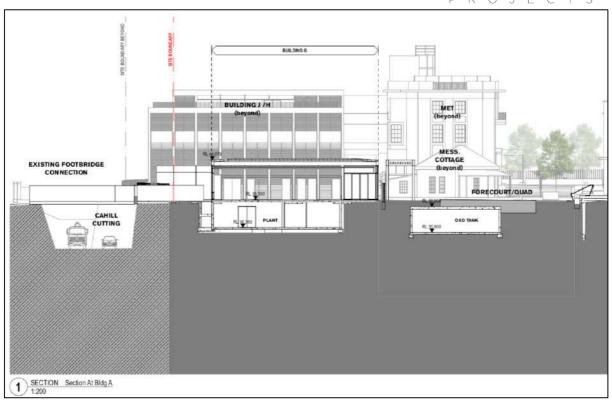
Section 1, c. North-South- New Basement and OSD Tank visible (Source: FJMT DWG DA-4001, 18.12.19
